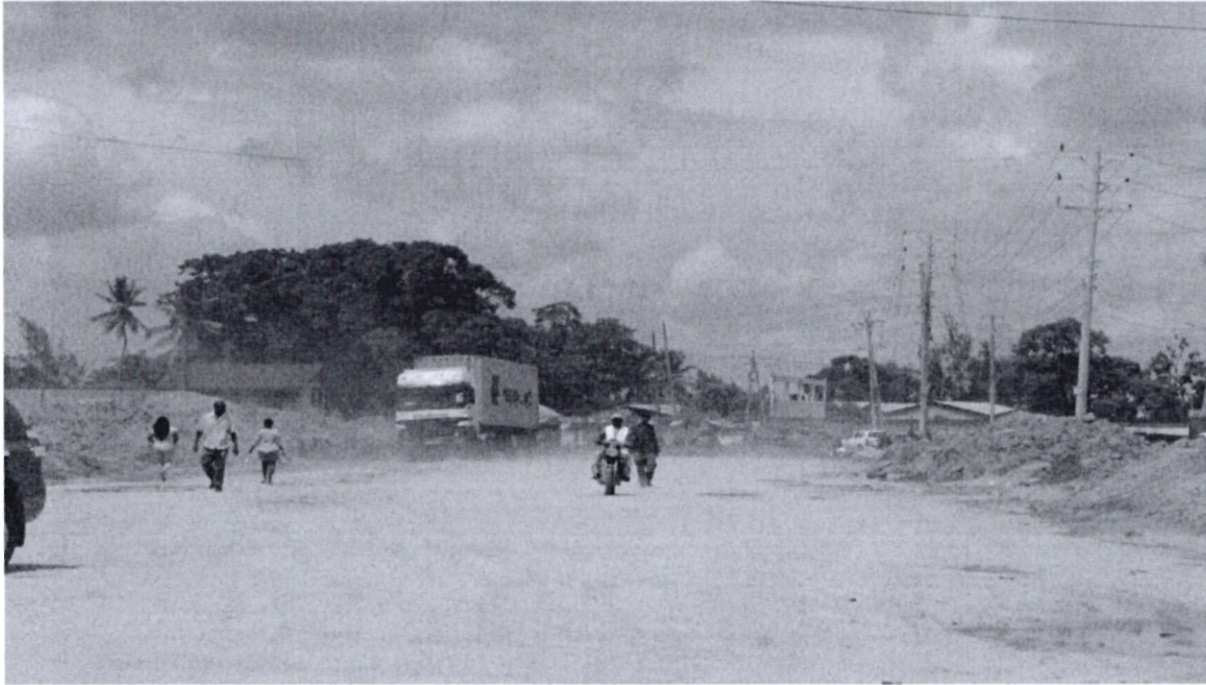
Incomplete sections of the road project at Kwa Jomvu area
